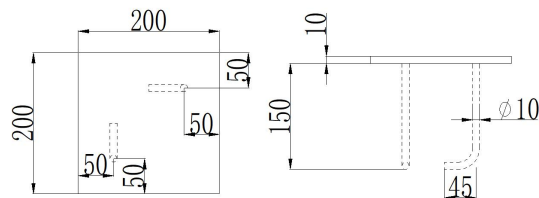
Equipment foundation drawing (unit: mm)
